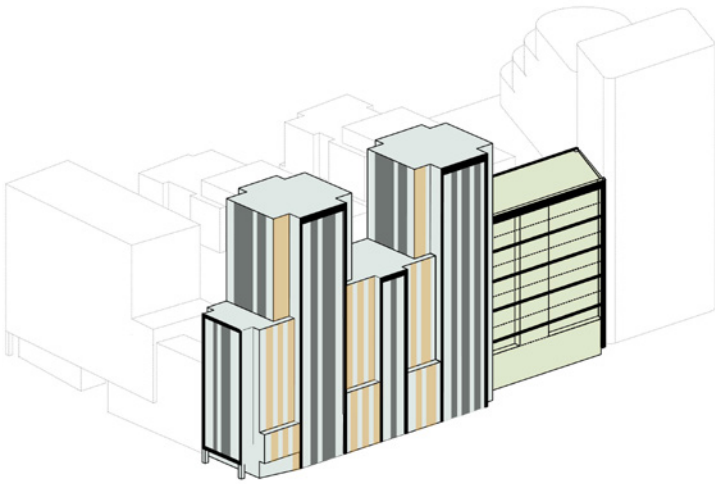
Building B2B3 articulation - Secondary vertical banding
